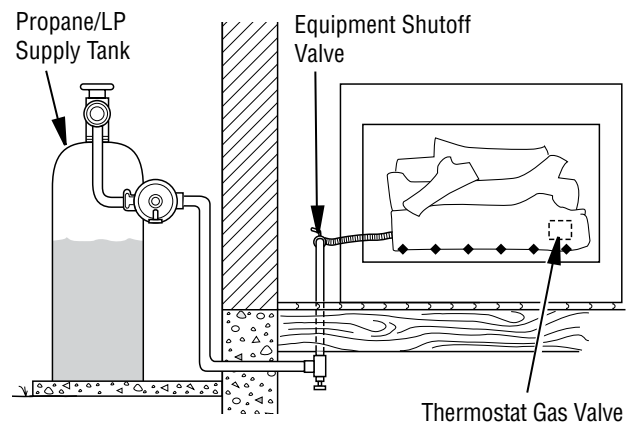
Checking Gas Joints (Propane/LP Gas Models)
